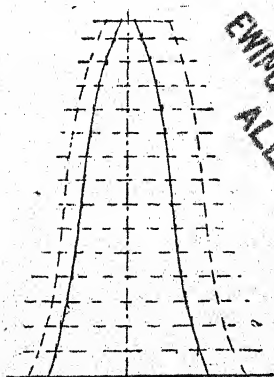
Lead Bay for Octagonal Turret Roof.
